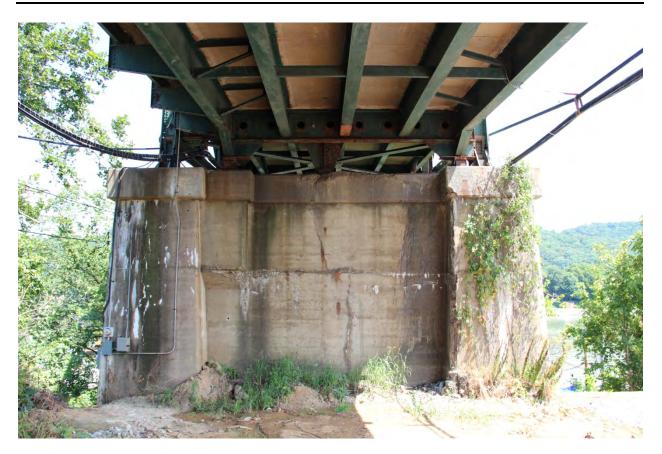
SOUTHWEST ELEVATION OF BRIDGE PIER NO. 1 SHOWING FLOORBEAMS, STRINGERS, AND ROCKER SHOES OF VIADUCT SPAN NO. 5 AND SHOES AND ANCHORAGE OF CANTILEVER TRUSS SPAN NO. 6, FACING NORTHEAST.
